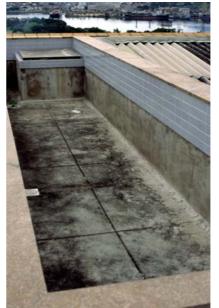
Renovated and newly sealed sealed planter box on the roof garden of the FAU, Ilha do Fundão, Rio.
